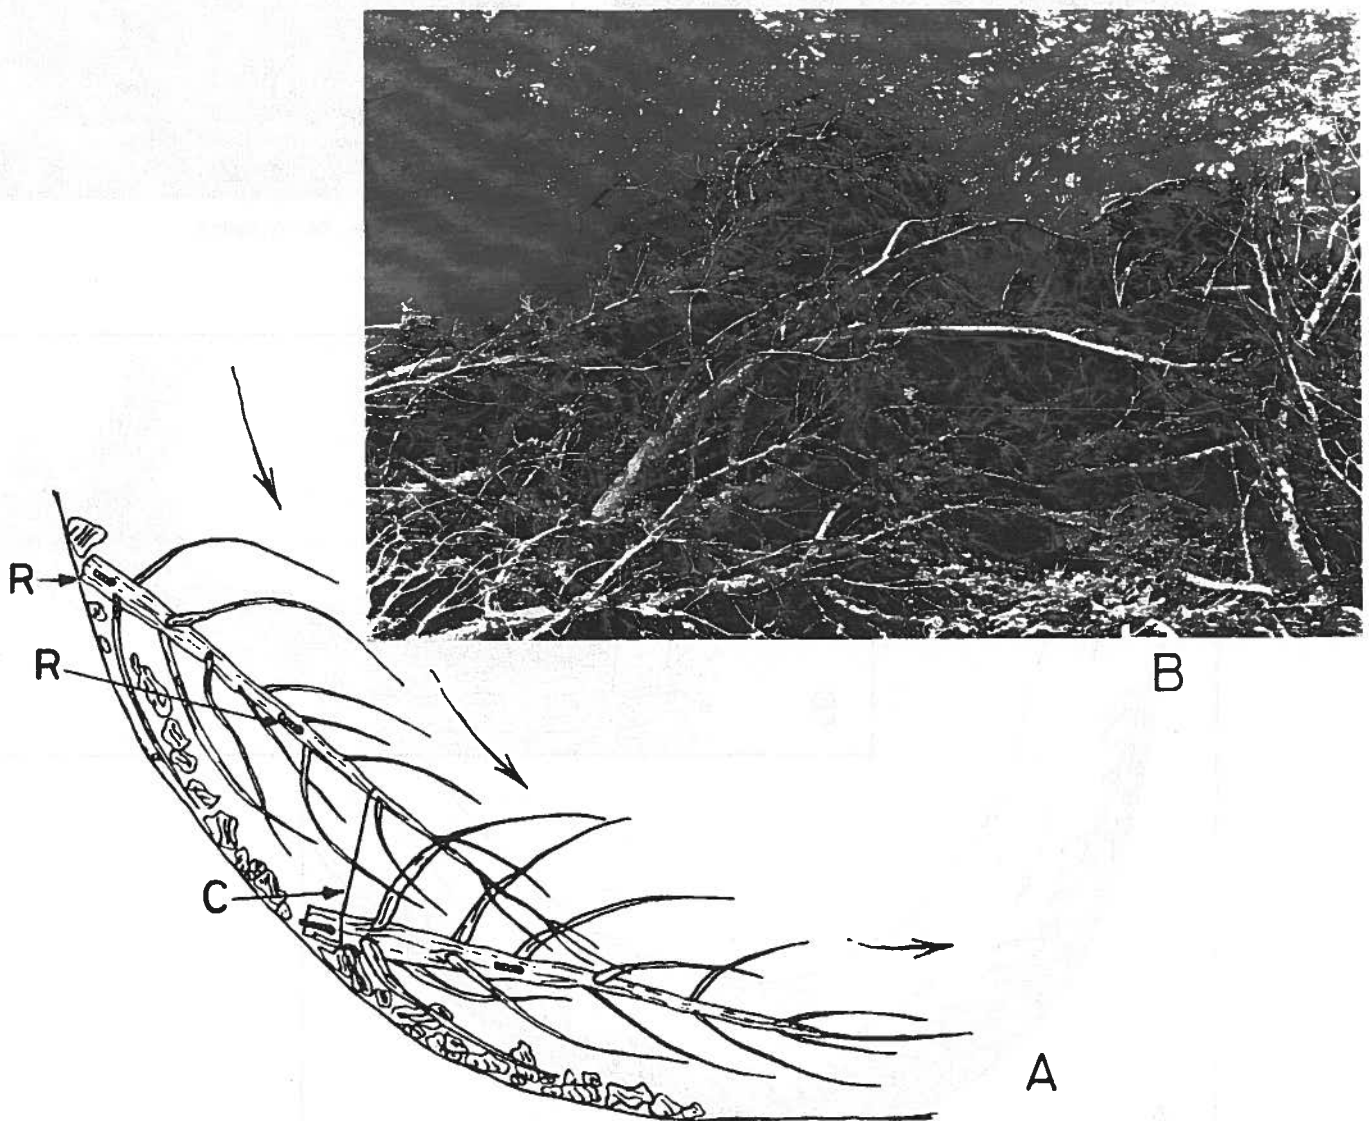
(A) Diagrammatic plan view of two trees in a revetment, showing overlap, rebar anchors (R), cabling (C), and rock backfill. (B) Close-up detail of juniper trees installed in revetment.
